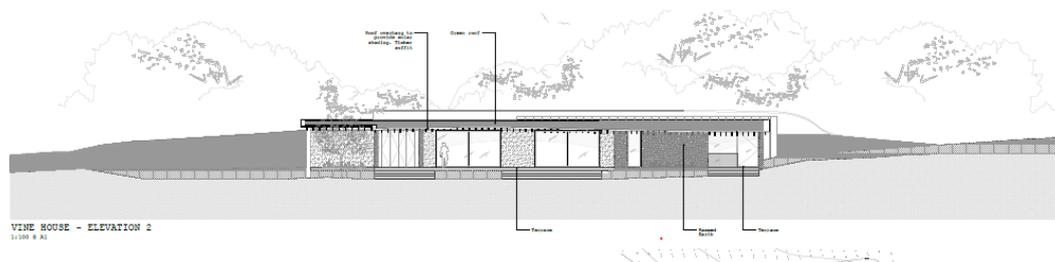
Proposed South Elevation (Side facing a new human made pond)
